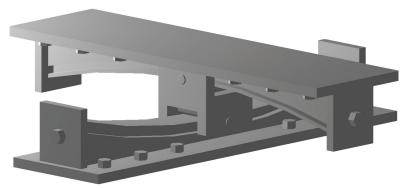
3D-drawing of the XY-FP bearing (Roussis, 2004)
